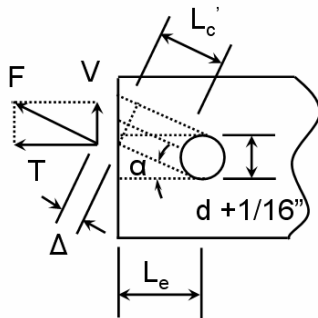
Bearing Failure with Force Not Perpendicular to Plate Edge
